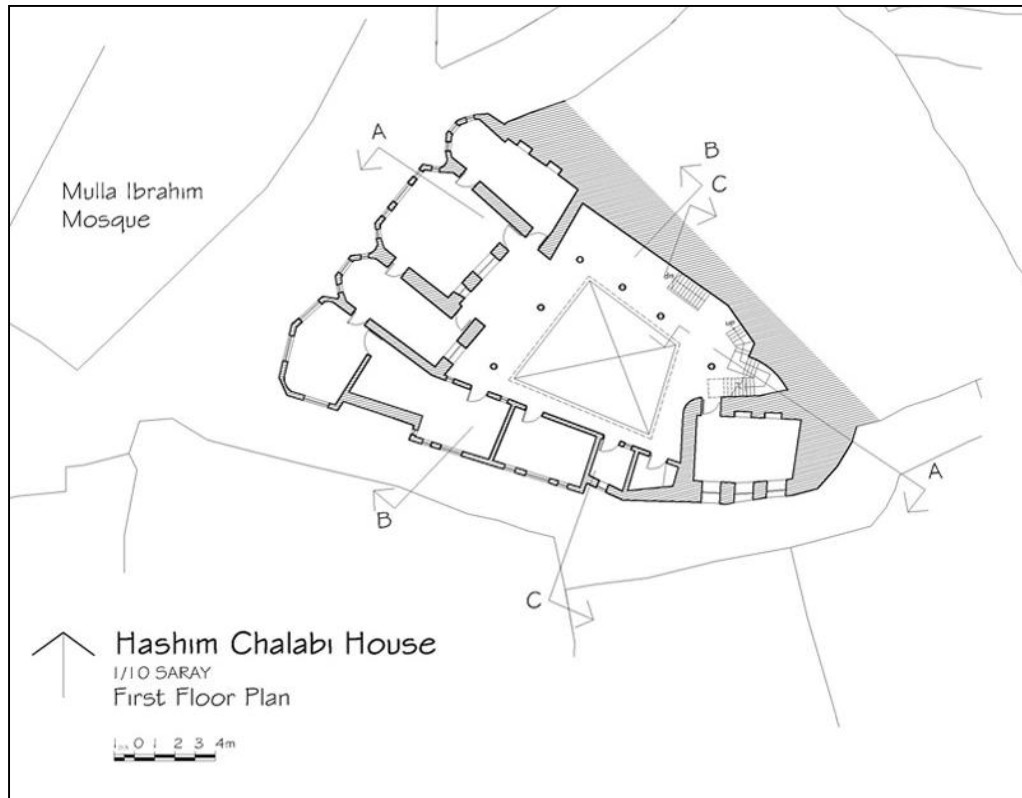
Plan of the first floor in Hashim Chalabi house (HCECR, 2012)
